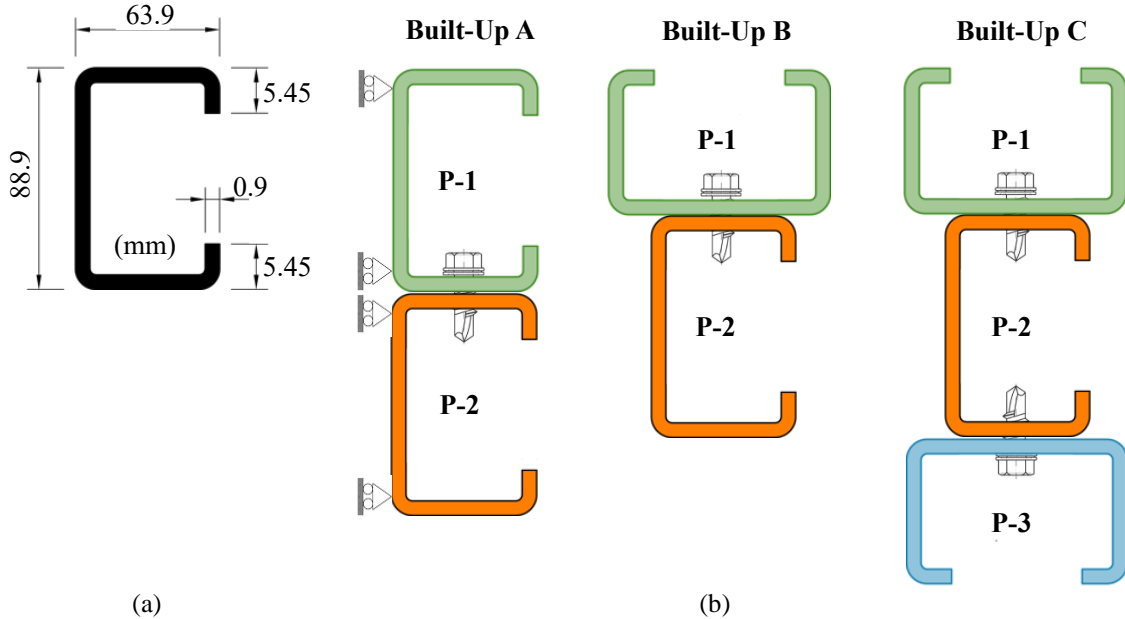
(a) Lipped channel dimensions and (b) built-up column cross-section and fastener locations considered in this work.
